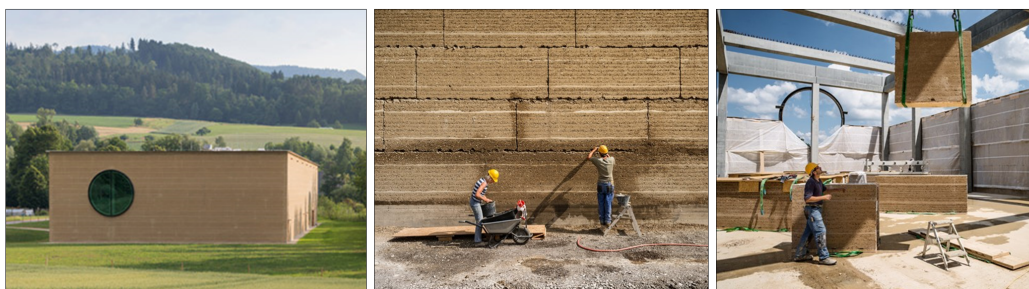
Prefabricated rammed earth wall used to build Ricola's factory in Switzerland; credits: Ricola.
